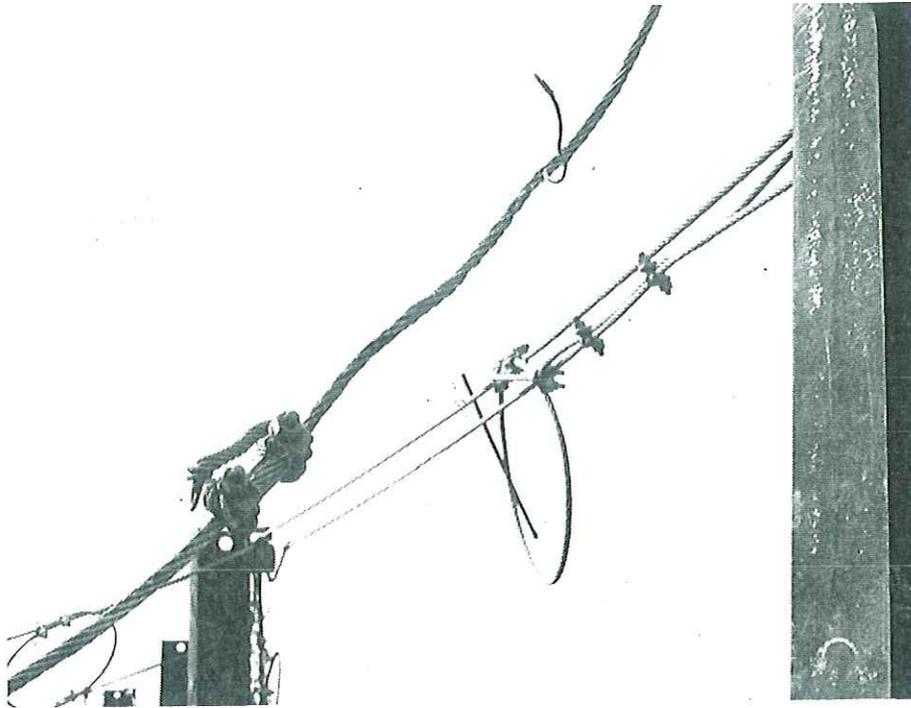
ACTIVATED BRUGG FRICTION BRAKE AND DAMAGED ANCHOR WIRE ROPE CAUSED BY IMPACTING ROCK #32. SEE PHOTO BELOW
